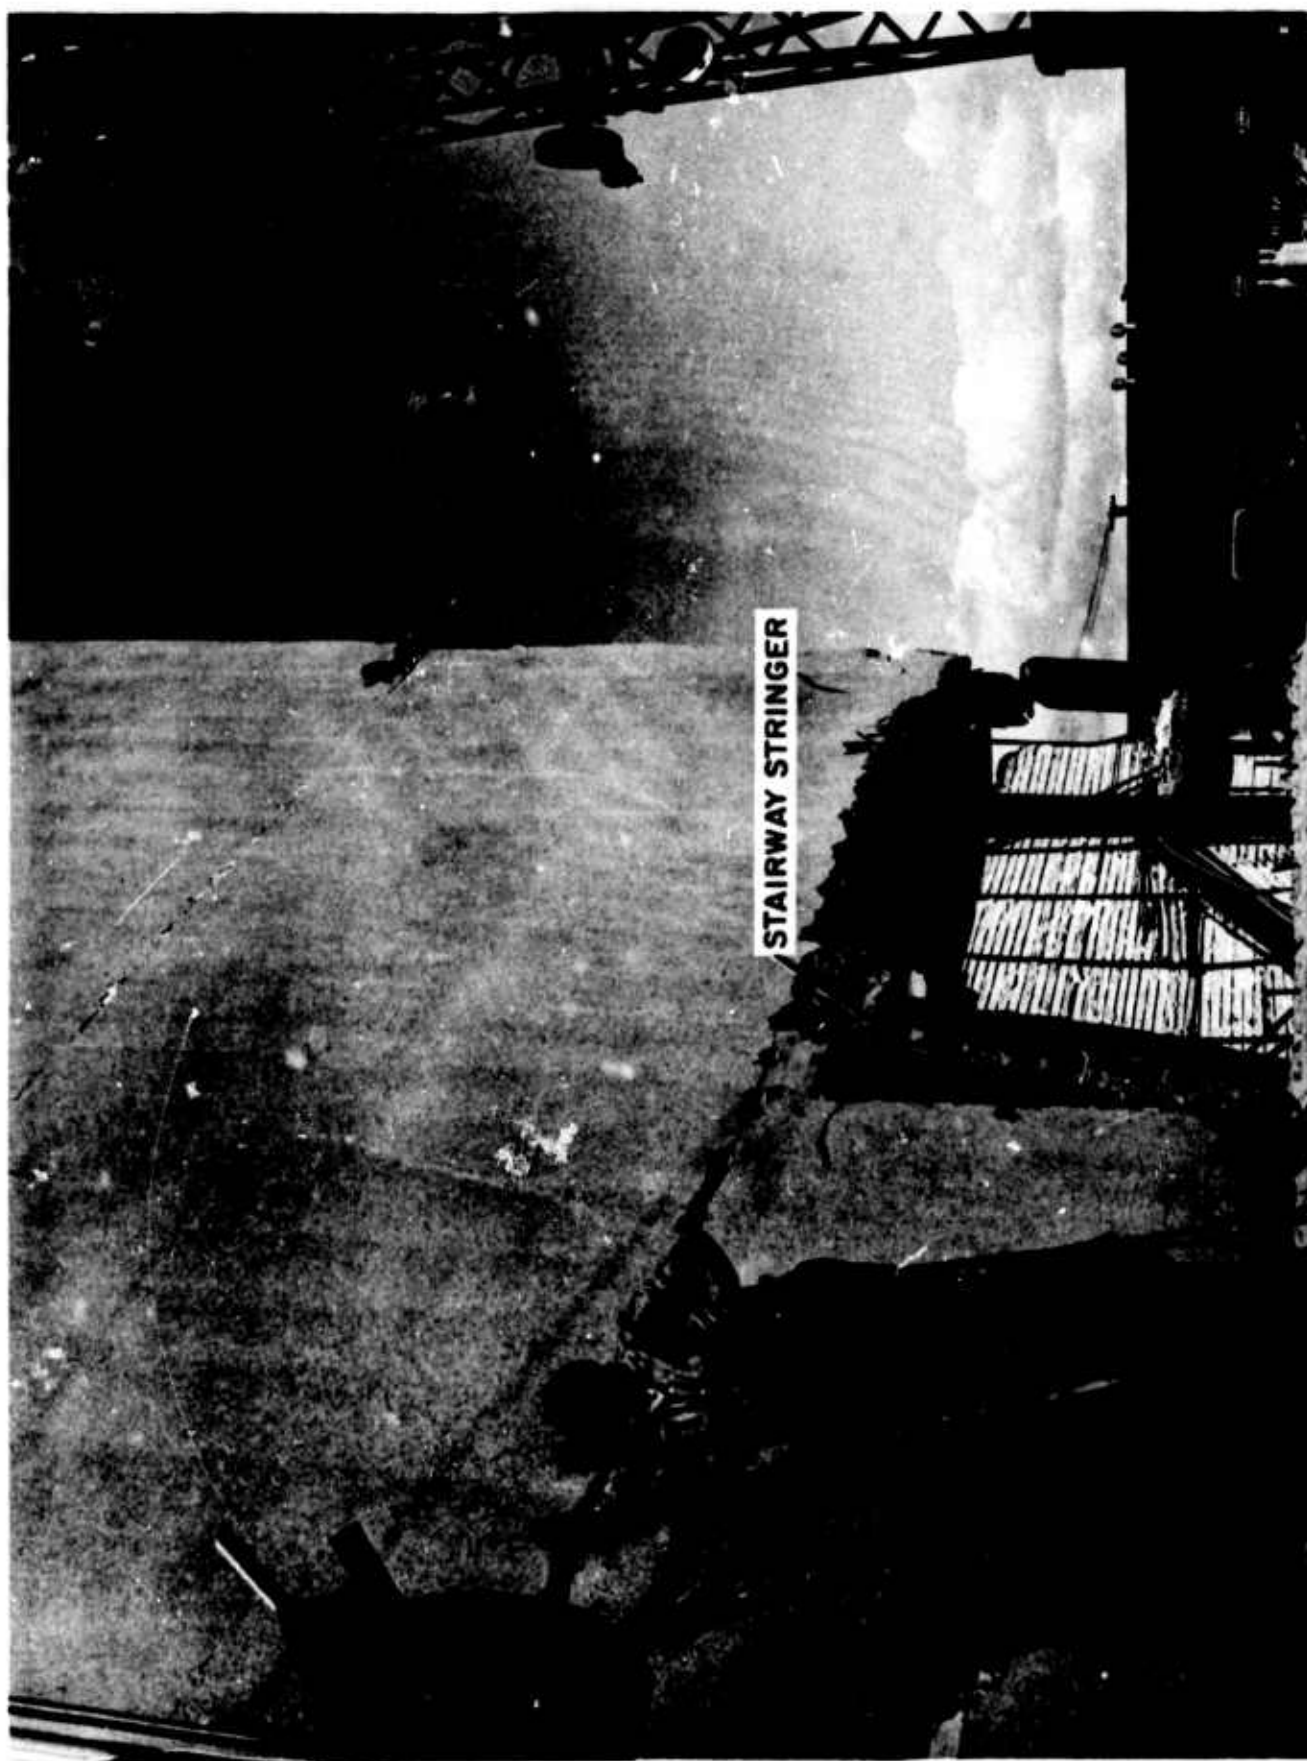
Cordova Building (Repair work progressed rapidly on building)
